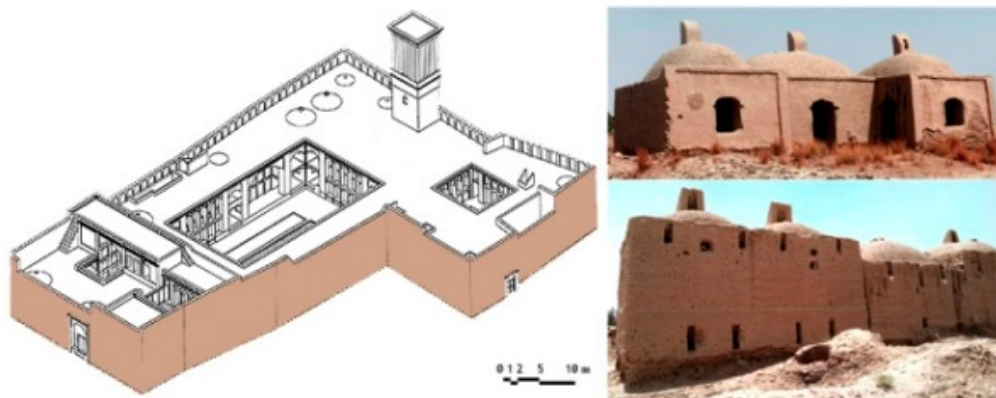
Facade of Mehraban house, Yazd (Left); and Facade of a typical house in Sistan (Right).
